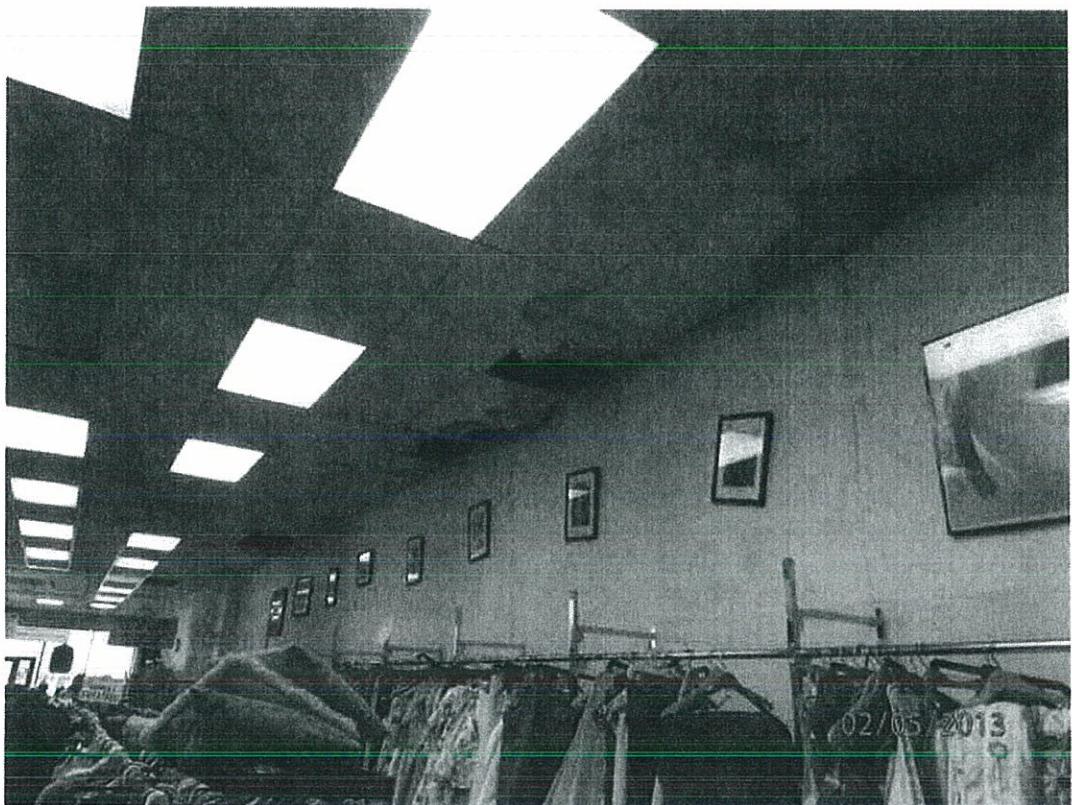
Interior Detail 2140 Market Street, Philadelphia, PA
